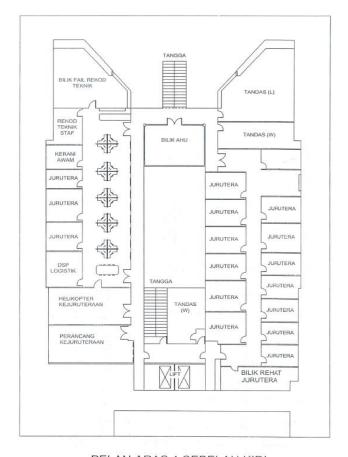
Facility Layout (GAM CAMO PGU Office – Ground Floor)
